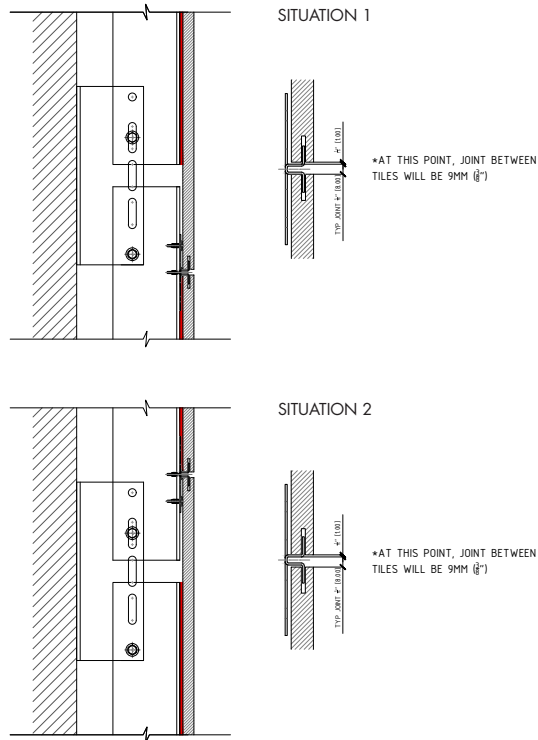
NO. OF FIXING POINTS AND LOCATION OF SPACER L-BRACKET
